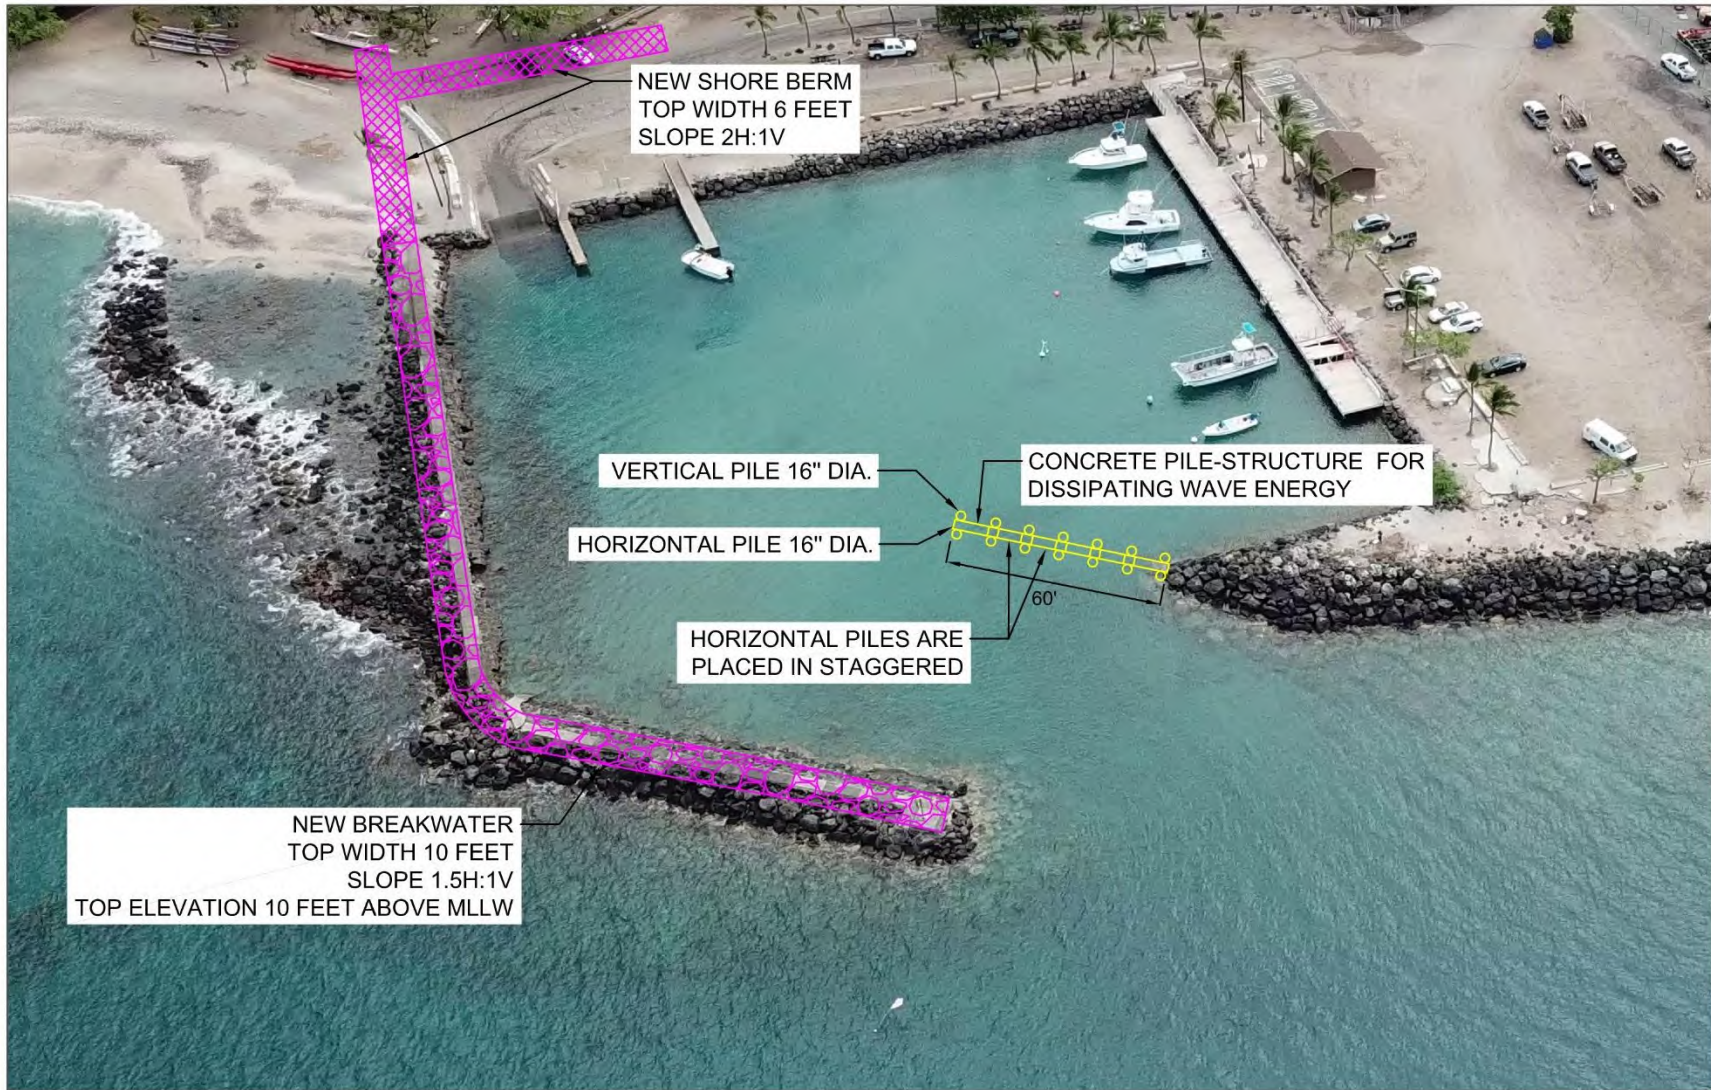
Alternative D: Breakwater Modification with Shore Berm Construction Plus Entrance Modification
